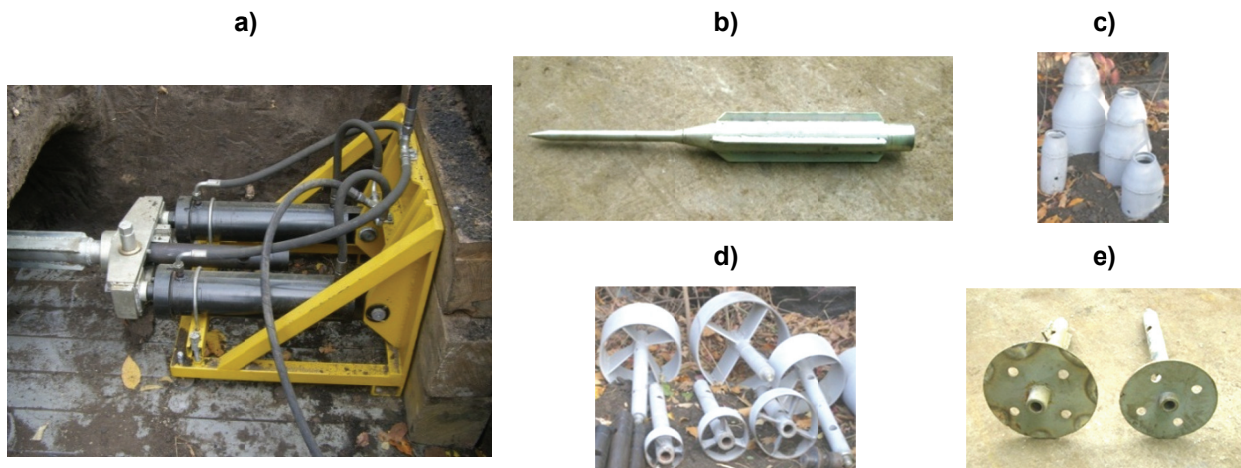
General view of the soil thrust boring plant and its working equipment: a – general view of a soil thrust boring plant; b – thrust boring head; c – conic expanders; d – cutting rings; e – cleaning discs
